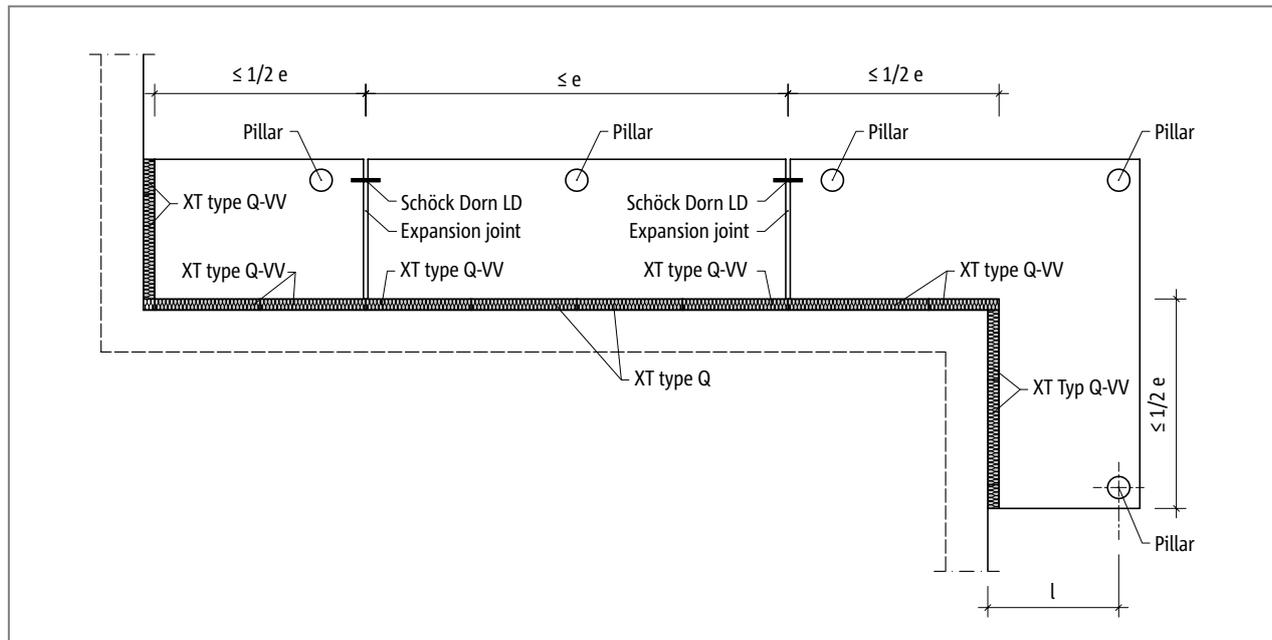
Schöck Isokorb® XT type Q, Q-VV: Expansion joint arrangement
